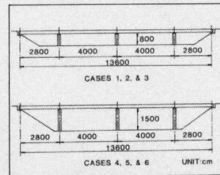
ELEVATIONS OF EXAMPLE FOUR-SPAN BOX-GIRDER BRIDGES
